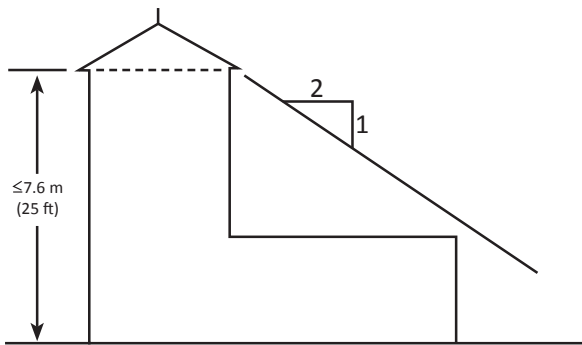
(b) Lower Roof Protection Provided by Pitched-Roof Buildings 7.6 m (25 ft) or Less in Height.
